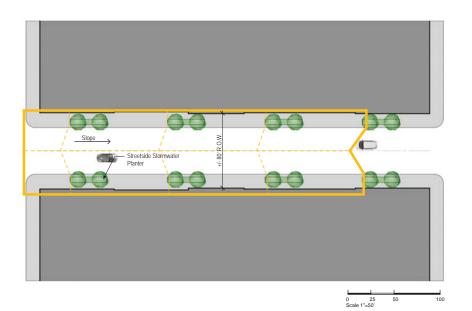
Streetside Stormwater in Urban Landscape (Source: Tetra Tech.2015.)
